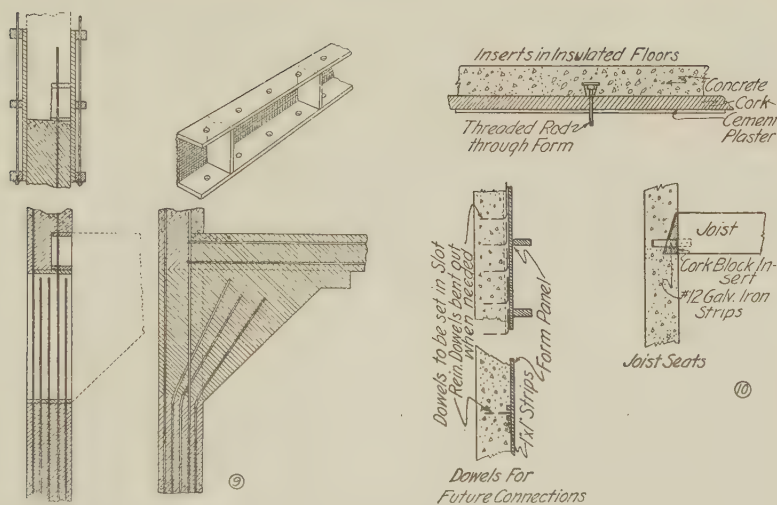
FLOOR SLOT AND POCKET FOR SLAB COLUMN BRACKET
